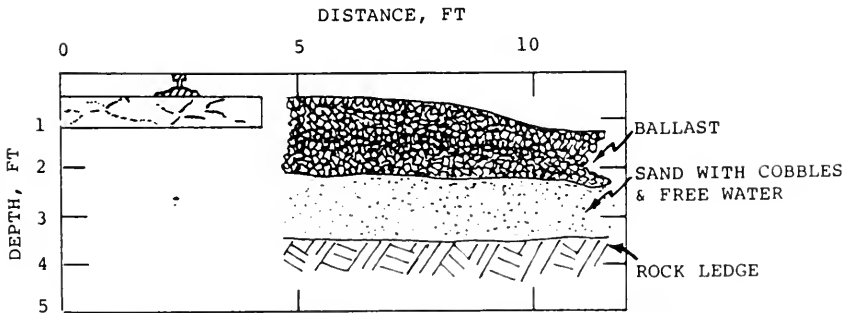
Transverse Cross Section at Site 2, Cross-Hole 1
